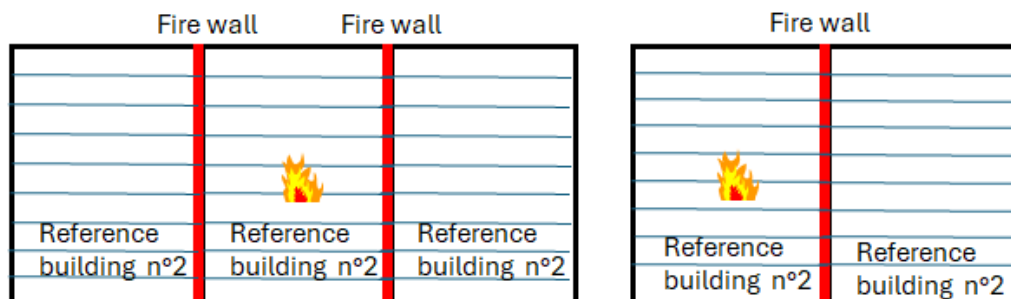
Studied building configurations - Fire wall perpendicular to steel portal frames
